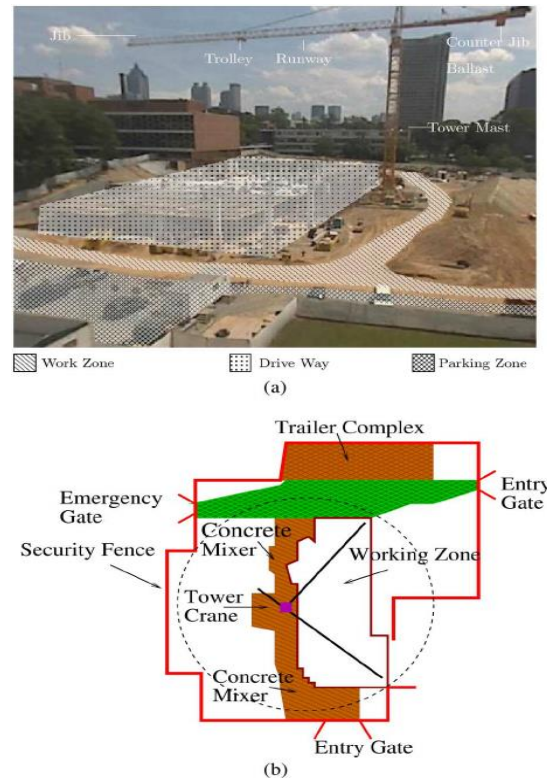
Accessibility of Tower Crane on Construction Site. A visual and 2D representation of working areas of a tower crane (Yang et al., 2014)
